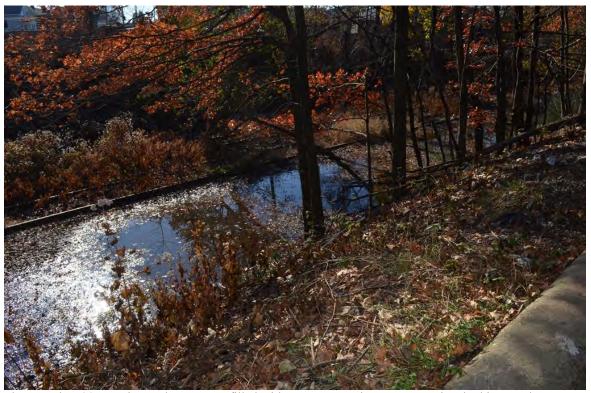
Section 4, former station remnants on top of the viaduct near Sharpe Avenue. View looking northwest.
